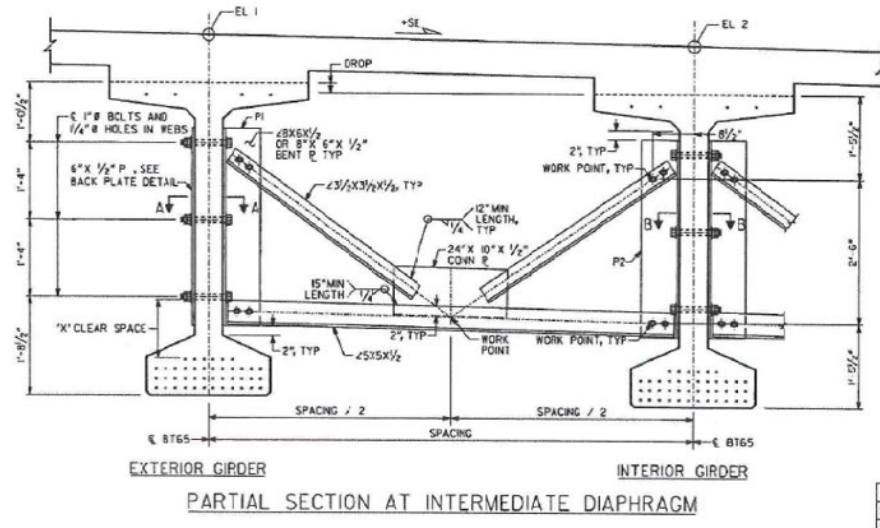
Drawing. Partial section at intermediate diaphragm of Span 14 of Bridge 11B
